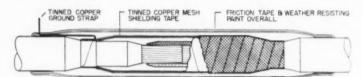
Straight joint for single-conductor, rubber-insulated, shielded, nonmetallic-sheathed cable.
